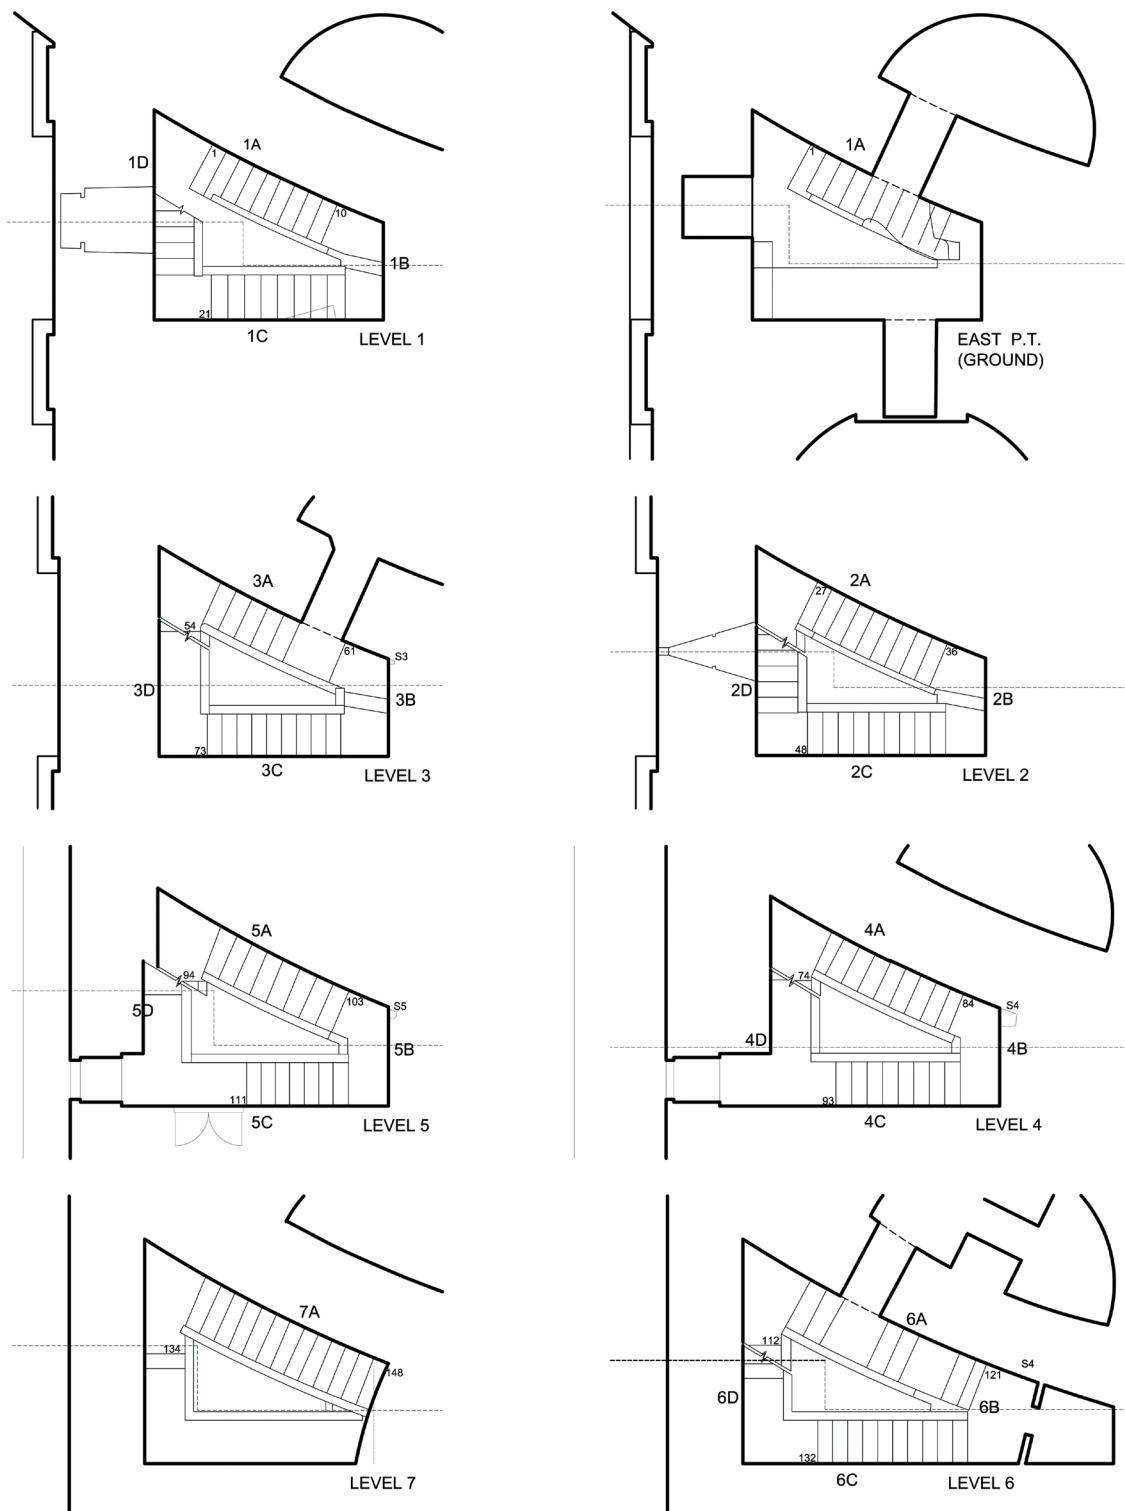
Plans of the East Stair, 1 : 150 (author, Roberta Zaccara and Robert Grover).
